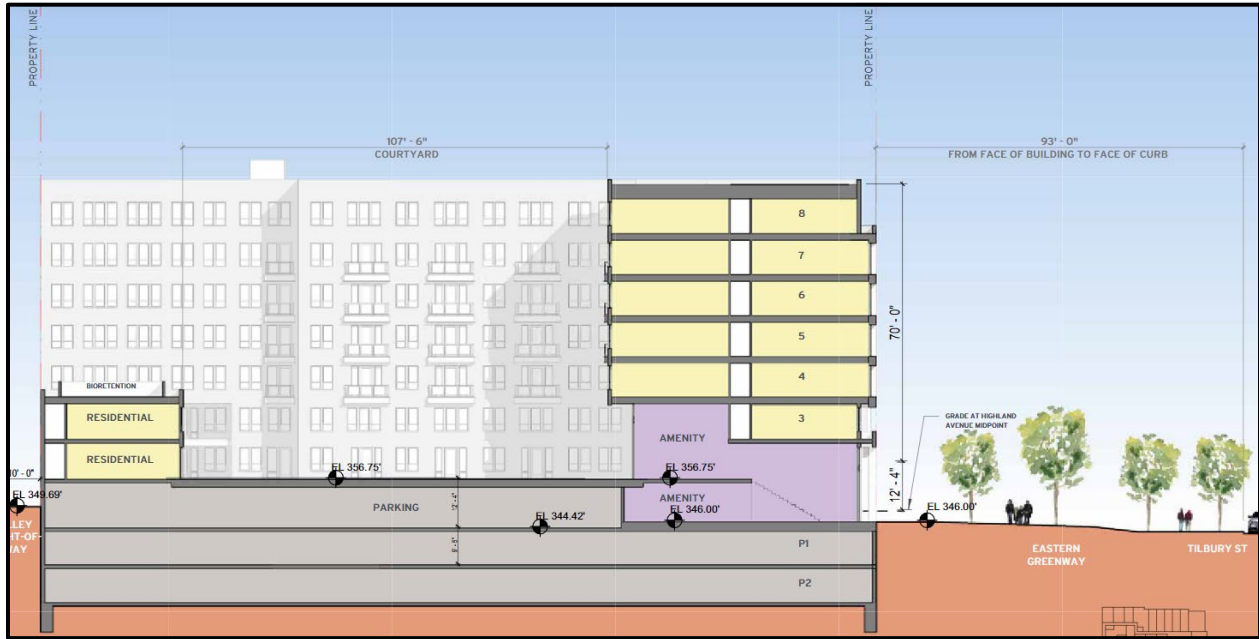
Section looking north towards Maple Avenue showing additional height from parking garage floor
